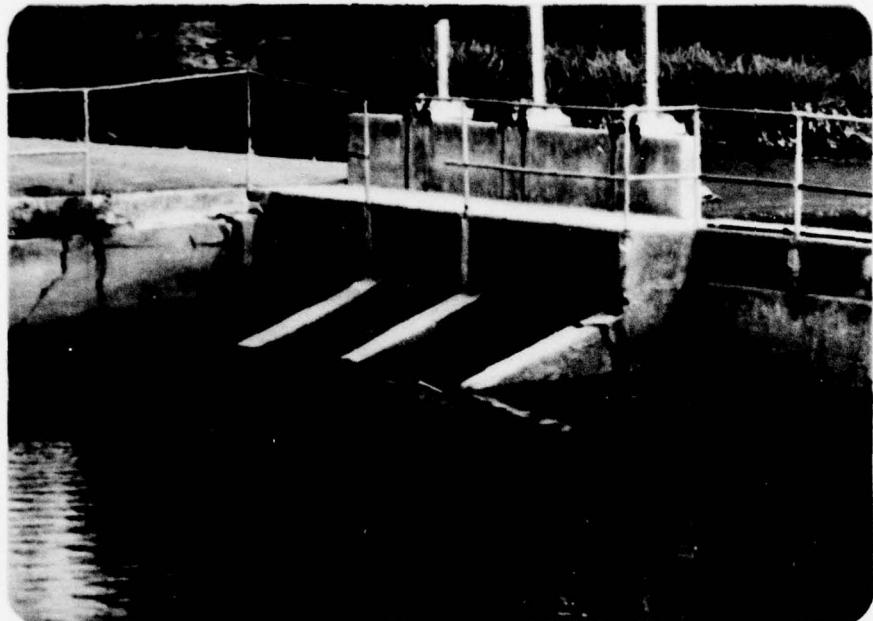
View of downstream face of low level outlet section showing cracked left buttress. Also note cracked abutment wall to the left. (Photo taken September 7, 1978)
